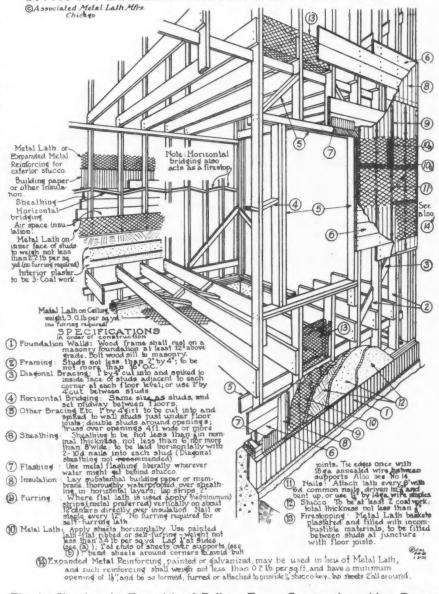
Showing the Essentials of Balloon Frame Construction with a Proper Base for Stucco.
